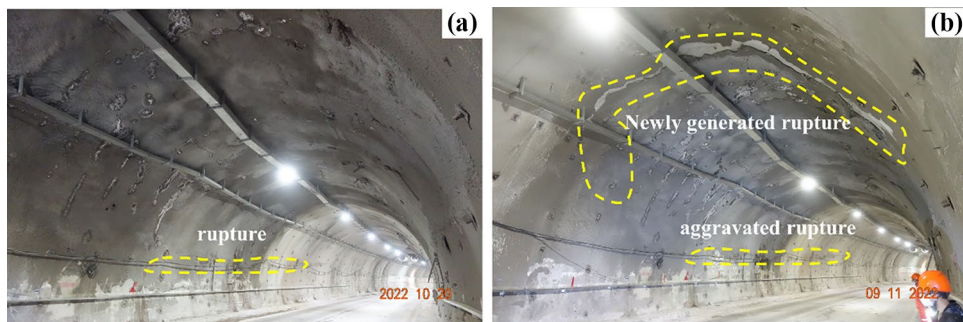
Photos of concrete cracking in the K8 + 486-K8 + 548 m section of the DWZ tunnel
